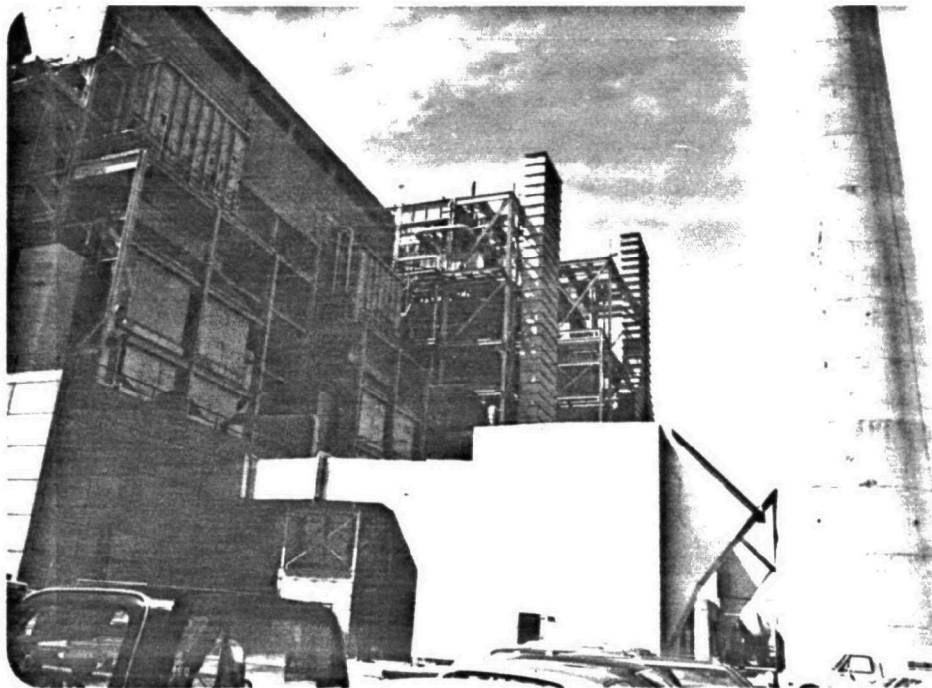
View from ground level facing west showing the induced fan house, duct work, and stack serving Boiler 1.
